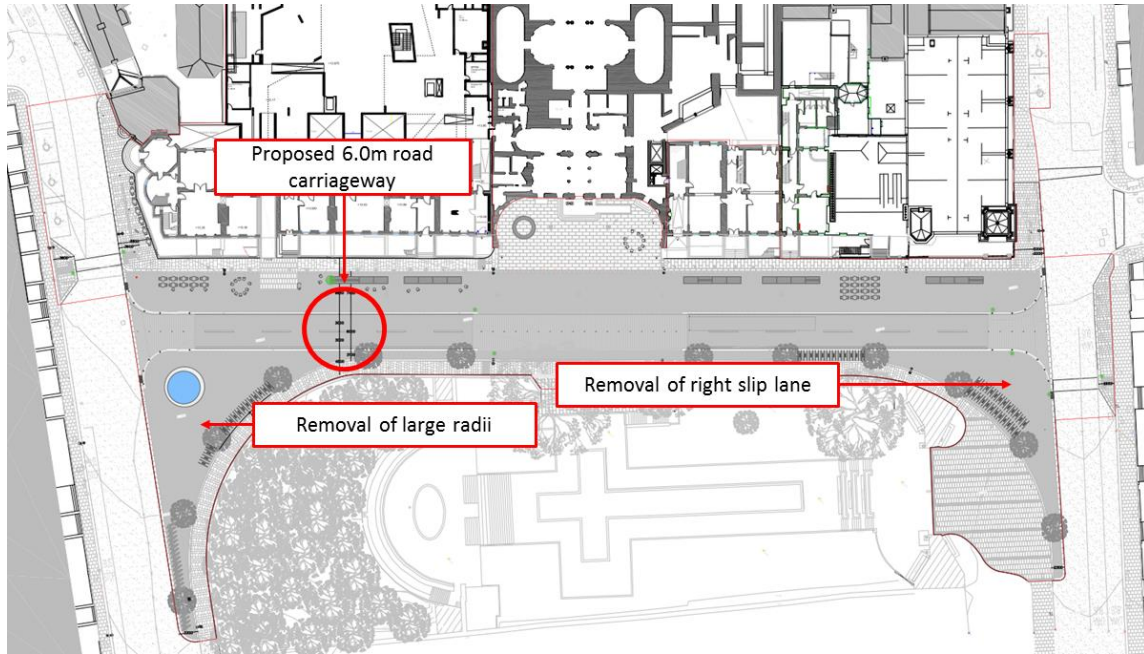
Proposed Changes to the Road Carriageway Layout
